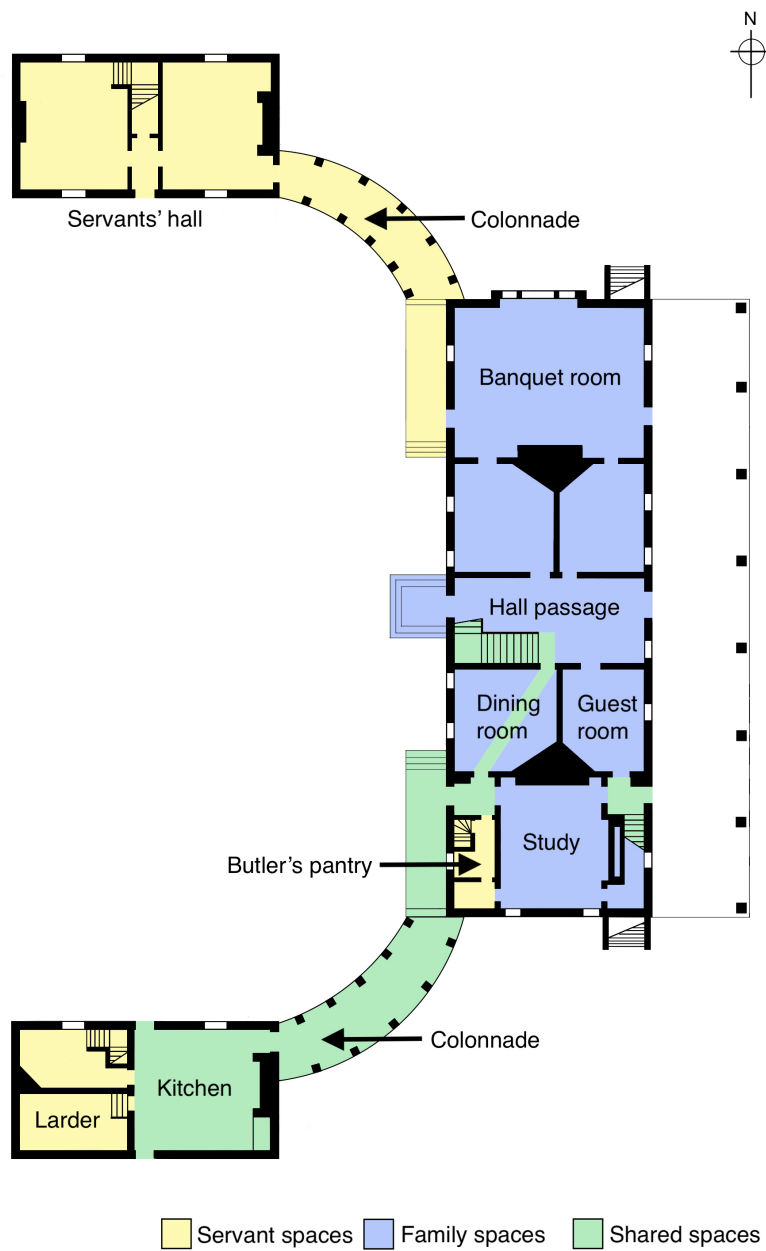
Mount Vernon c1799 Phase 2 ground floor plan
